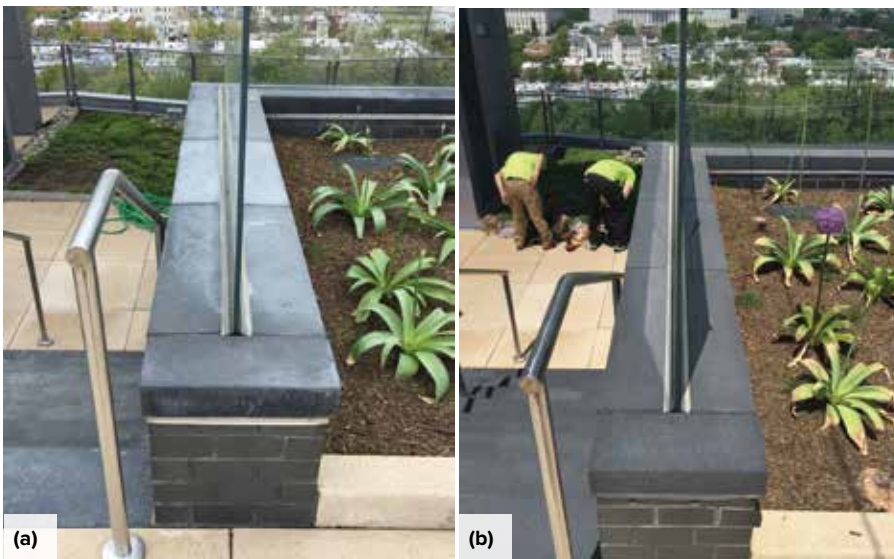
Cast stone pavers serve as coping on a masonry wall: (a) efflorescence diminished the appearance of the wall; and (b) final cleaning exposed the true color of the pavers
